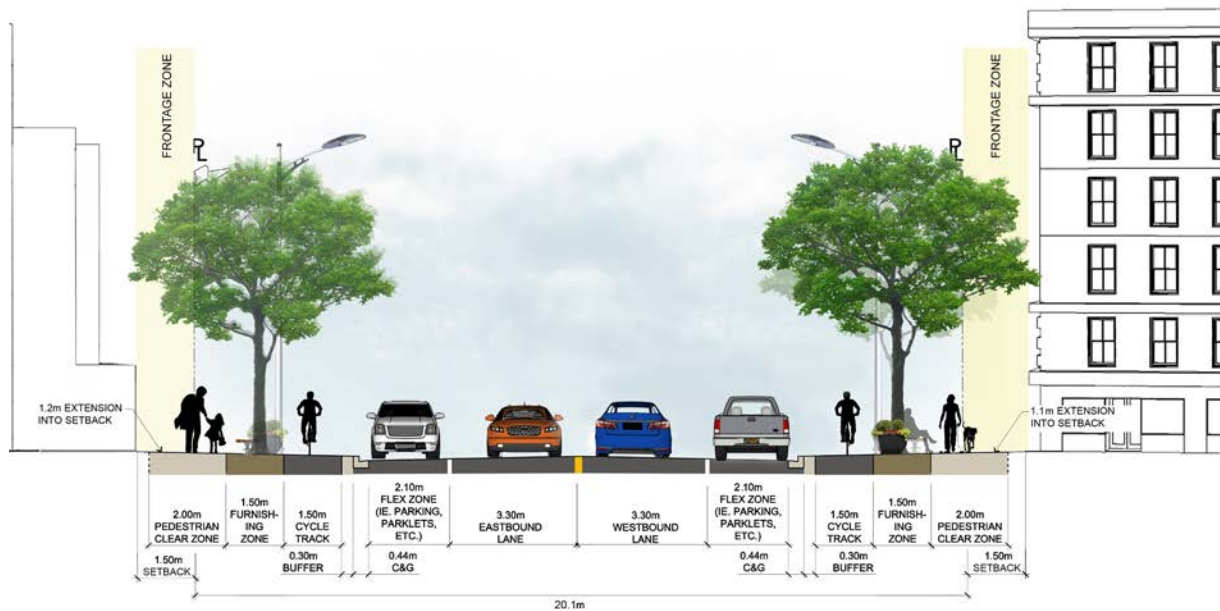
THE CORE (45 STREET TO 46 STREET N.W.) SECTION - ULTIMATE
